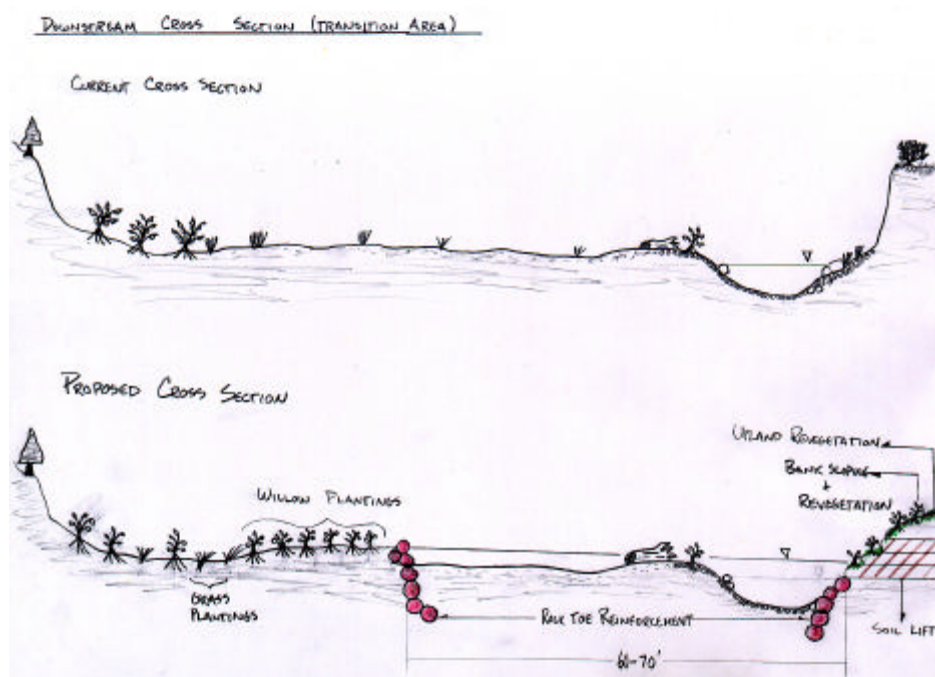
Downstream Transition Area Bank Protection, Cross Sections
